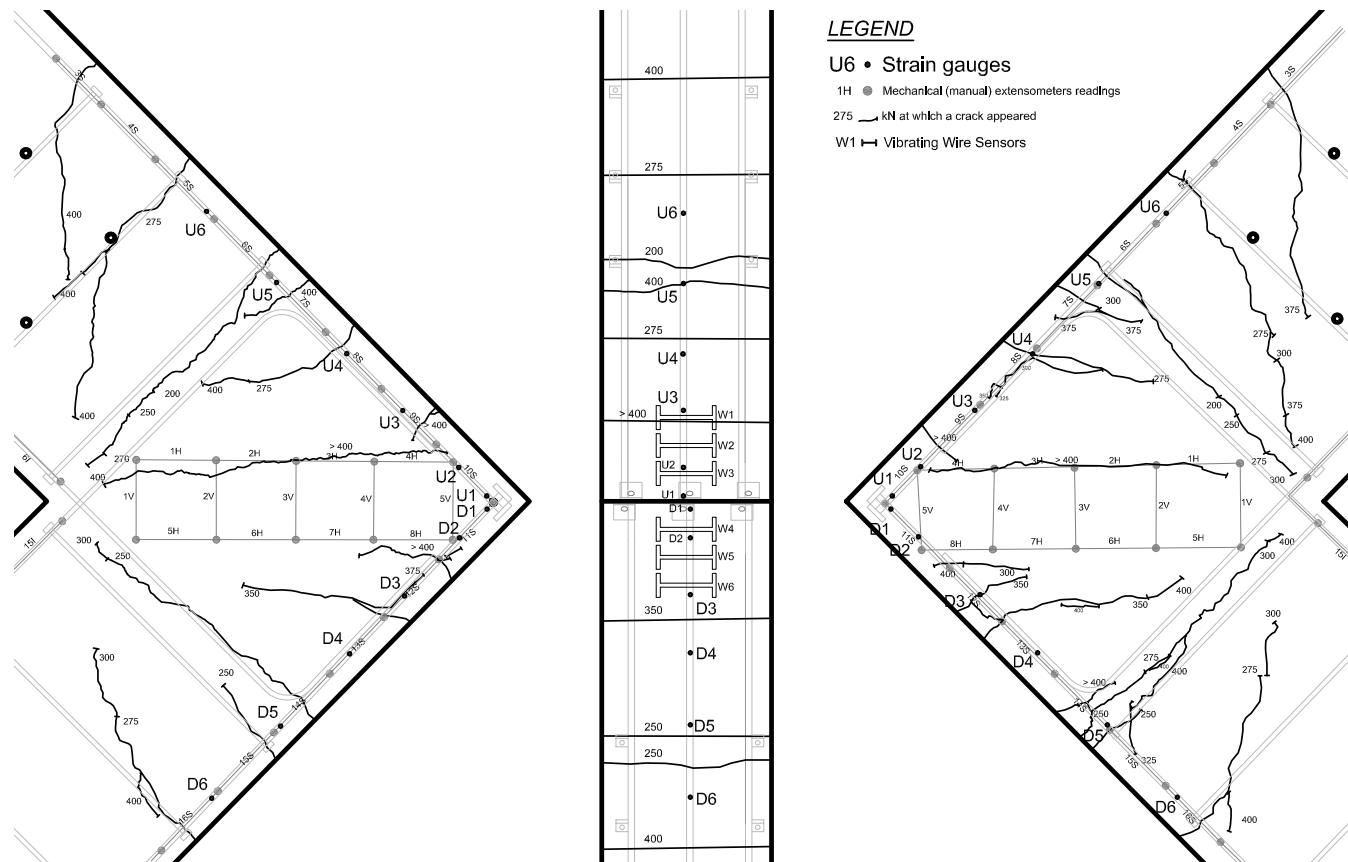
25-TH-16. Crack pattern before failure. From left to right: front view (A), side view, front view (B)
